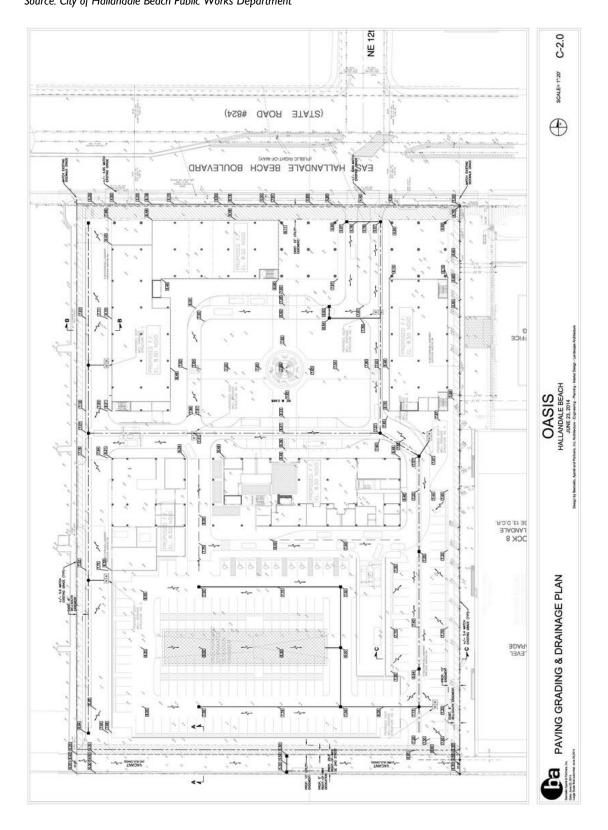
Proposed Site Sewer InfrastructureSource: City of Hallandale Beach Public Works Department
